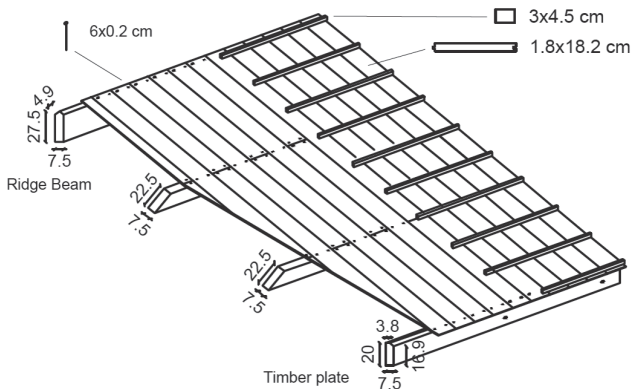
Geometry and details of the timber roof diaphragms (dimensions in cm)
